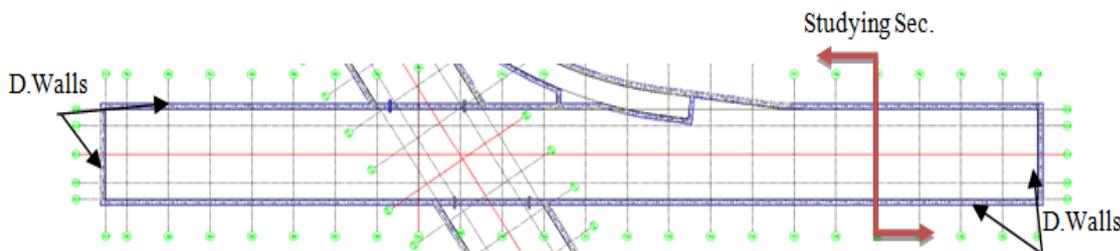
The general layout of the tunnel-station Intersection (Heliopolis Station – Cairo Metro Tunnel – Line 3 [8,9].
